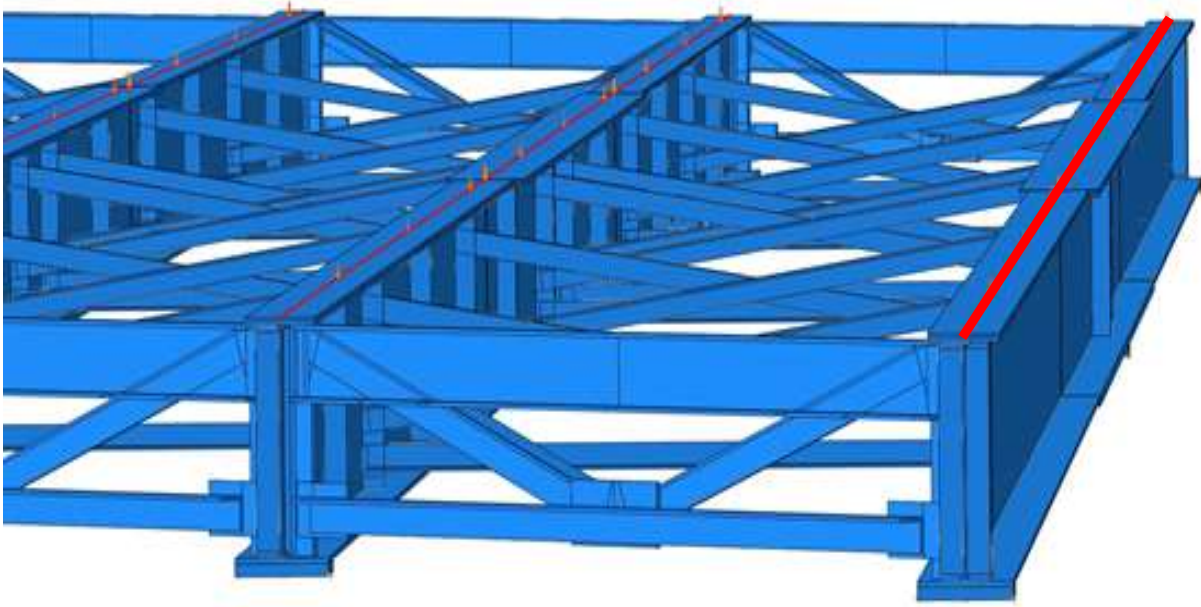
Model with no overhang bracket plates and overhang loads applied to the top of the exterior girder
